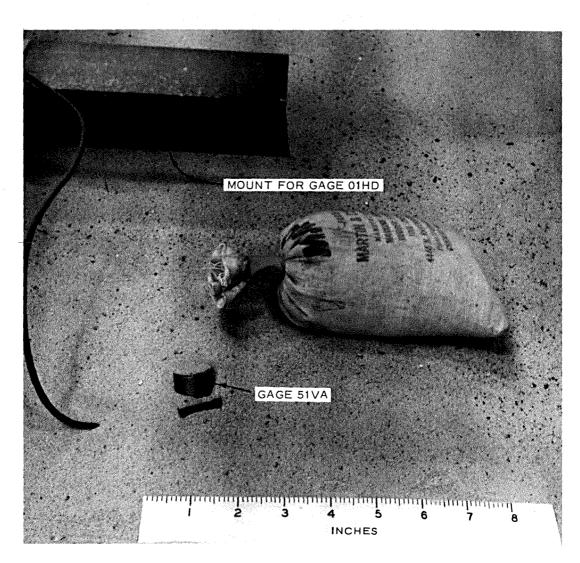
Dislocation of Gage 51VA caused by spalling of the interior floor during Shot 5.
